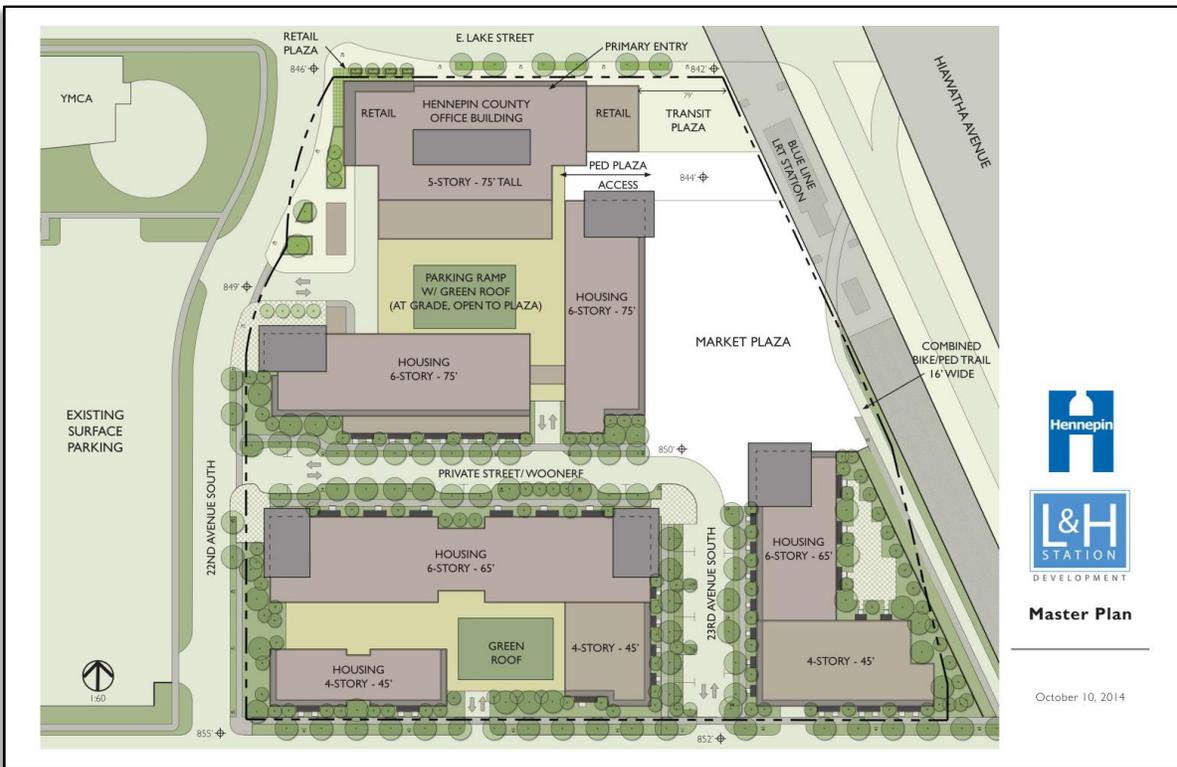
B – SITE LAYOUT FOR FULL BUILD-OUT
